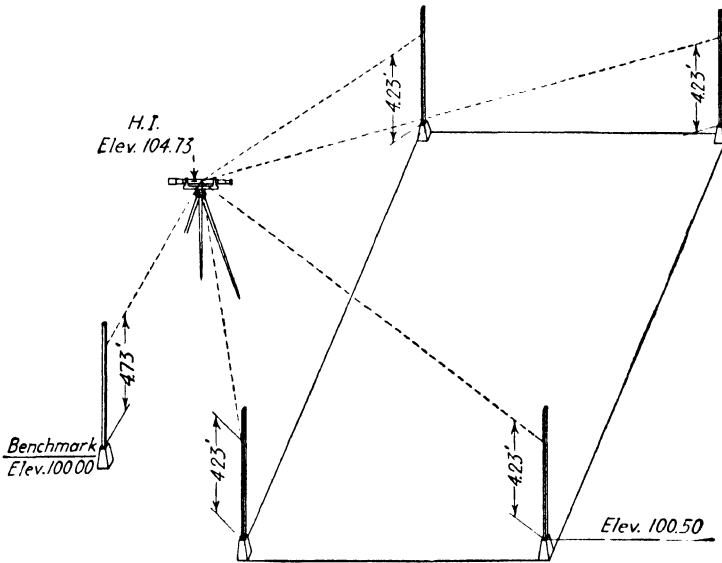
To establish a plane to a definite elevation from a bench mark.
